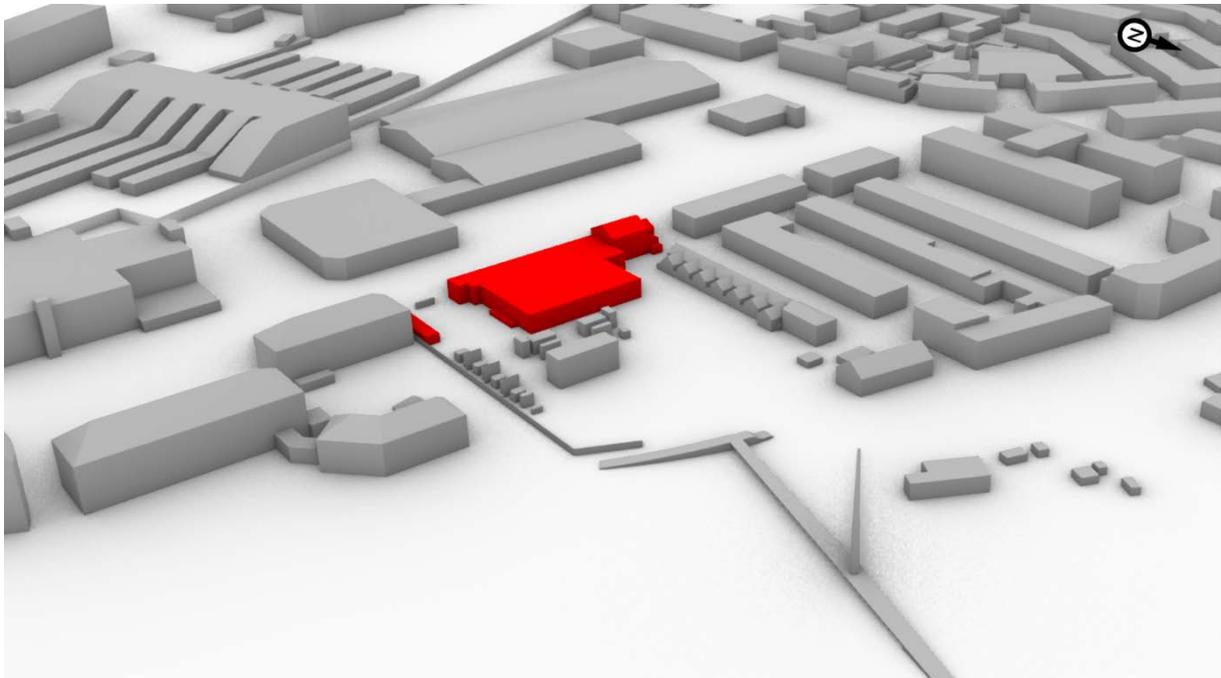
Existing Site with Existing Surrounding Buildings (Configuration 1) - View from the north-east
